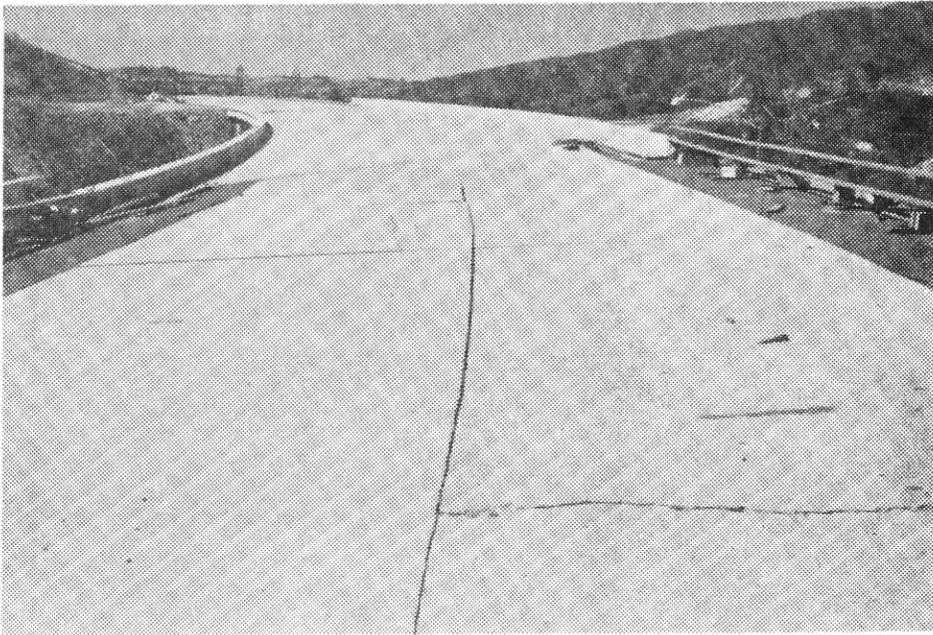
Pavement cracks and movement at the easterly approach to Bridge 53-1988L on the A-Y Connector, Route 5/210 Interchange.
